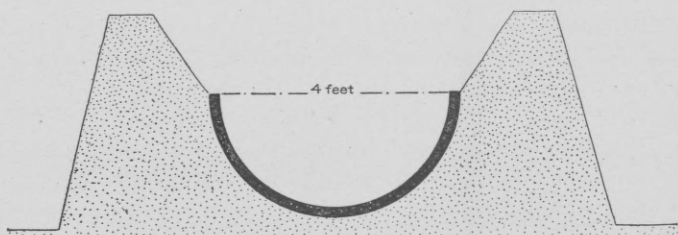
Cross section of sewer-farm ditch at San Antonio.
